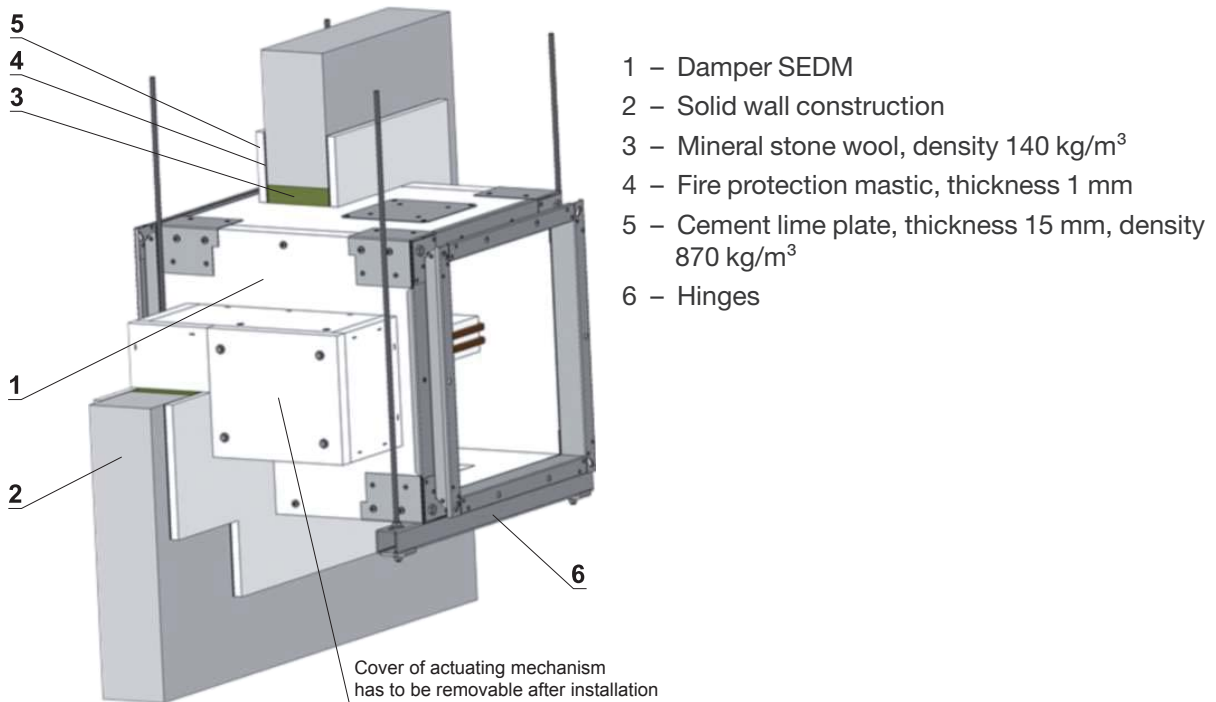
Example of installation in solid wall construction of fire compartment - vertical blade axis position
